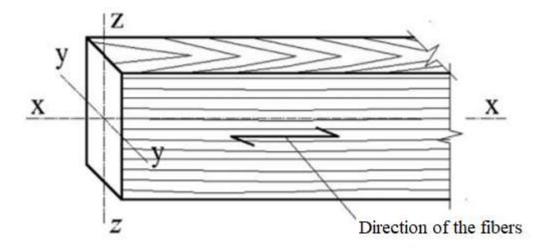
The location scheme of the cross-section's axes of the wooden element
